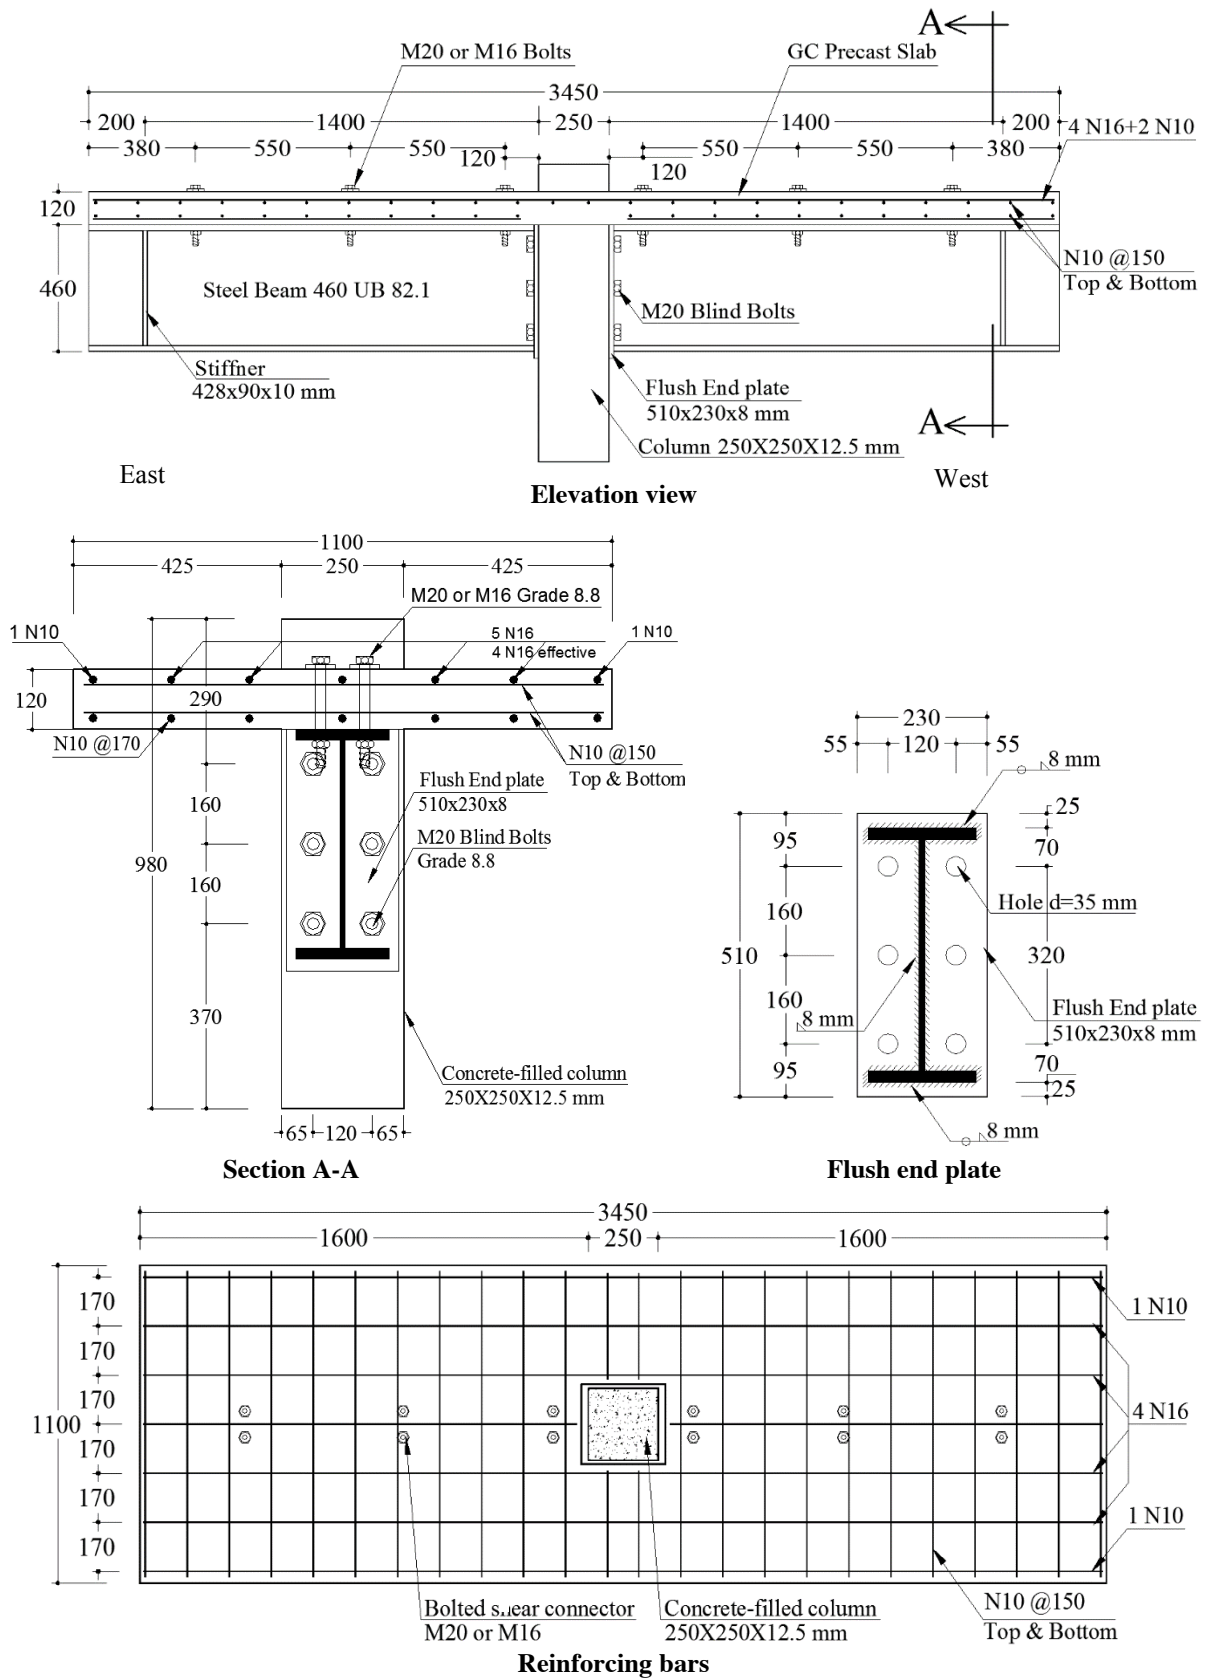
Geometry and details of joints CJ1 and CJ2 (unit: mm)
